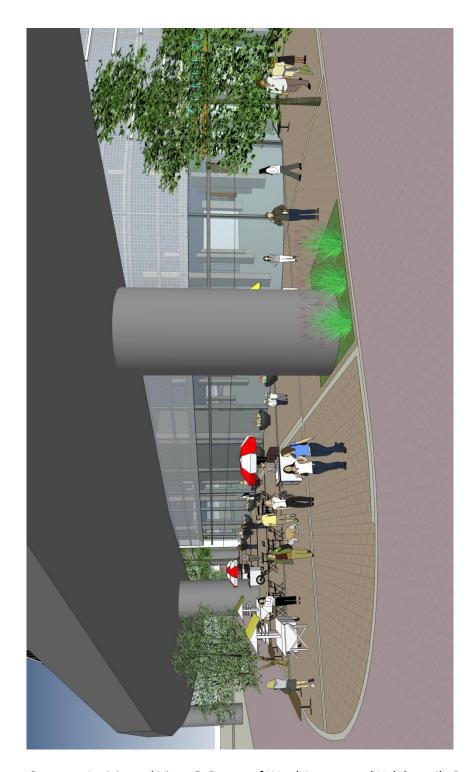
Anticipated View @ Corner of Ward Avenue and Halekauwila Street
